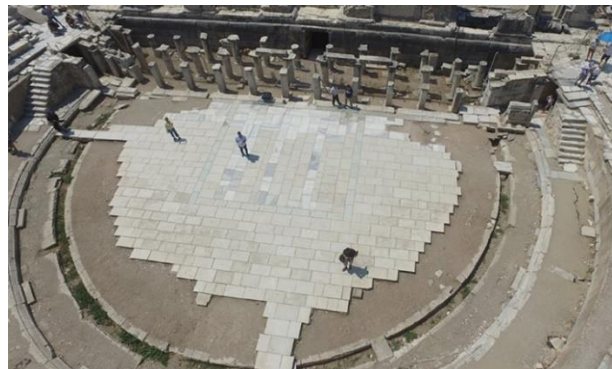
Concrete imitation floor coverings made in the 70s (Republic of Türkiye Ministry of Culture and Tourism, 2021)
